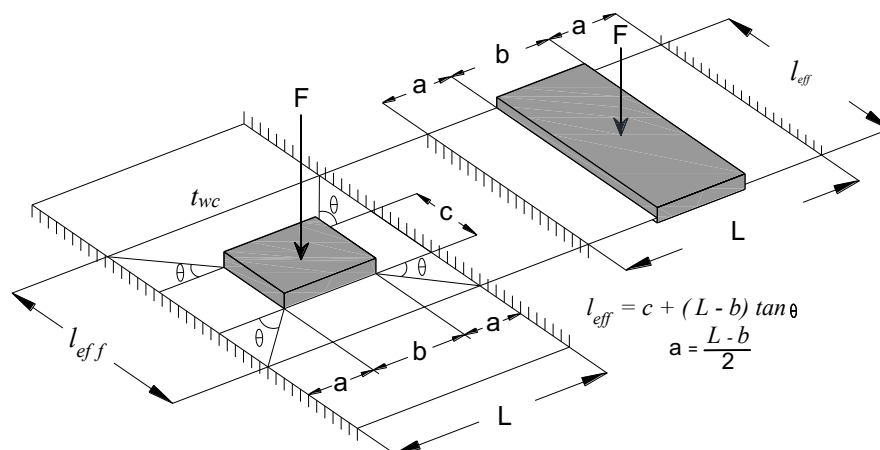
Rigid strip model for column face component of concrete-filled hollow section [10]
